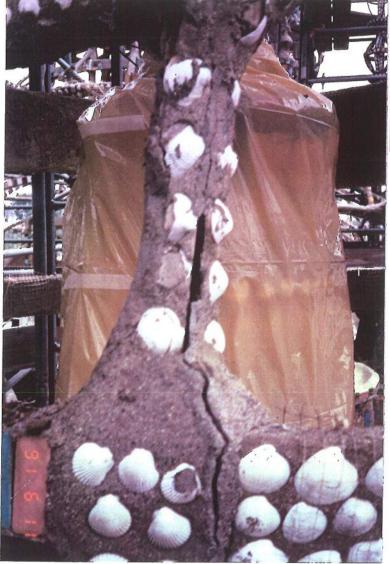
Major crack in vertical 04 before removal & replacement of rebar. Jun 1991. ATO C W.
